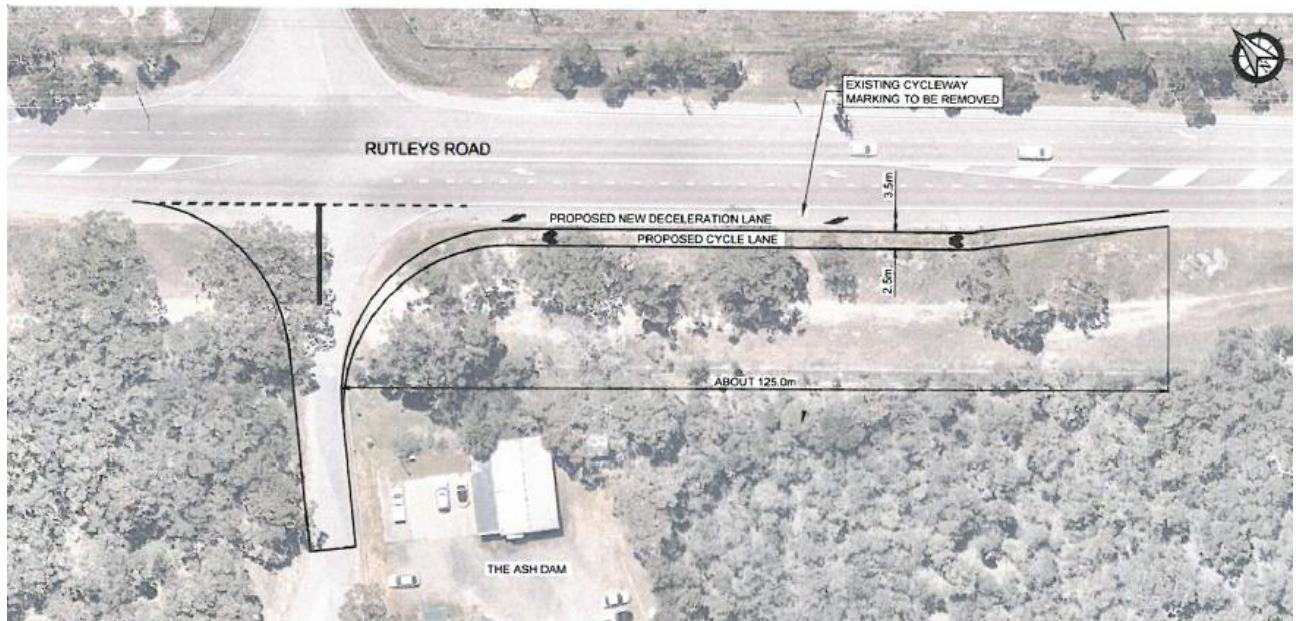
Proposed Ruttleys Road Access Upgrade
